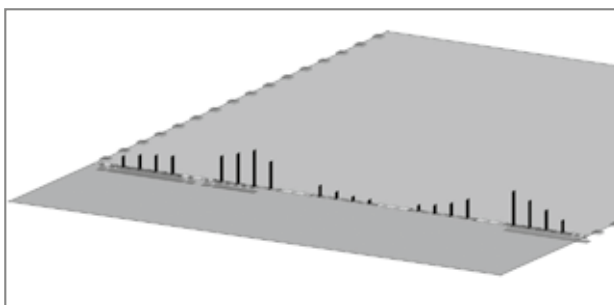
Schöck Isokorb® T type K-E, K-T: 3D view of uneven shear force distribution; the floor only supports the balcony at the ends, in-between the floor hangs on the balcony
